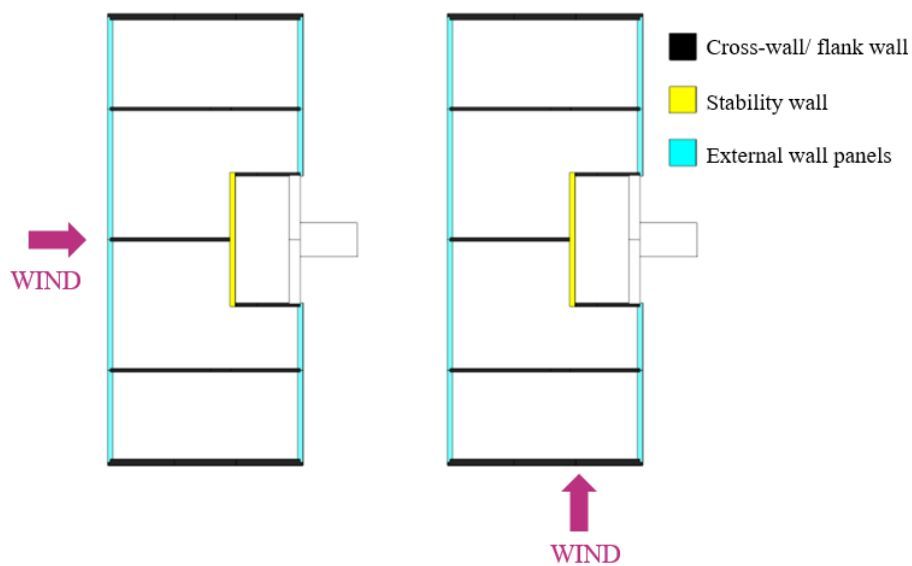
Wind loading perpendicular to each building face of the residential block was considered
